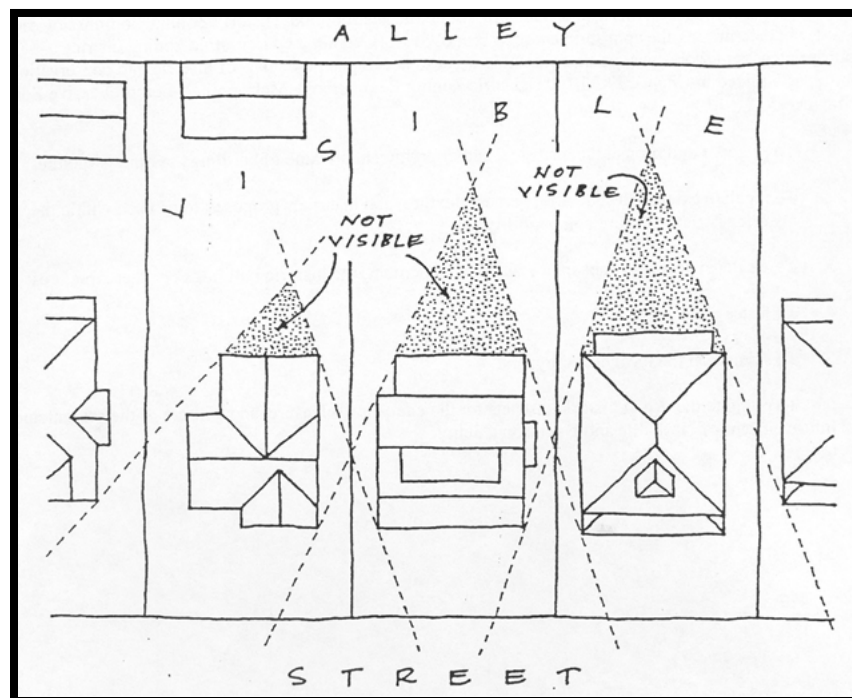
DESIGN REVIEW IS MORE FLEXIBLE FOR BACK ELEVATIONS NOT READILY VISIBLE FROM PUBLIC STREETS OR SIDEWALKS AND OUT OF PUBLIC VIEW.
